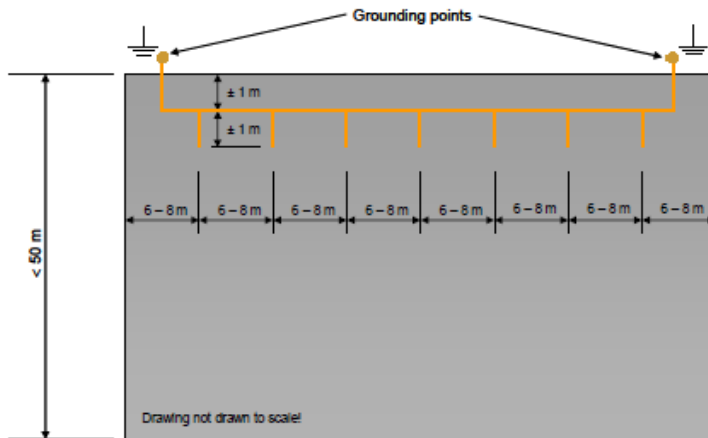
Copper strip layout for rooms > 50 m<sup>2</sup>, alternative A
